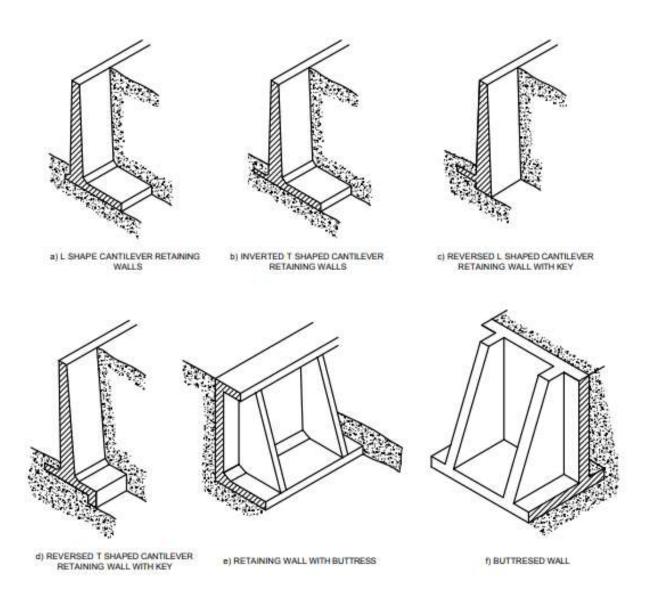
TYPES OF RCC CANTILEVER RETAINING WALL
